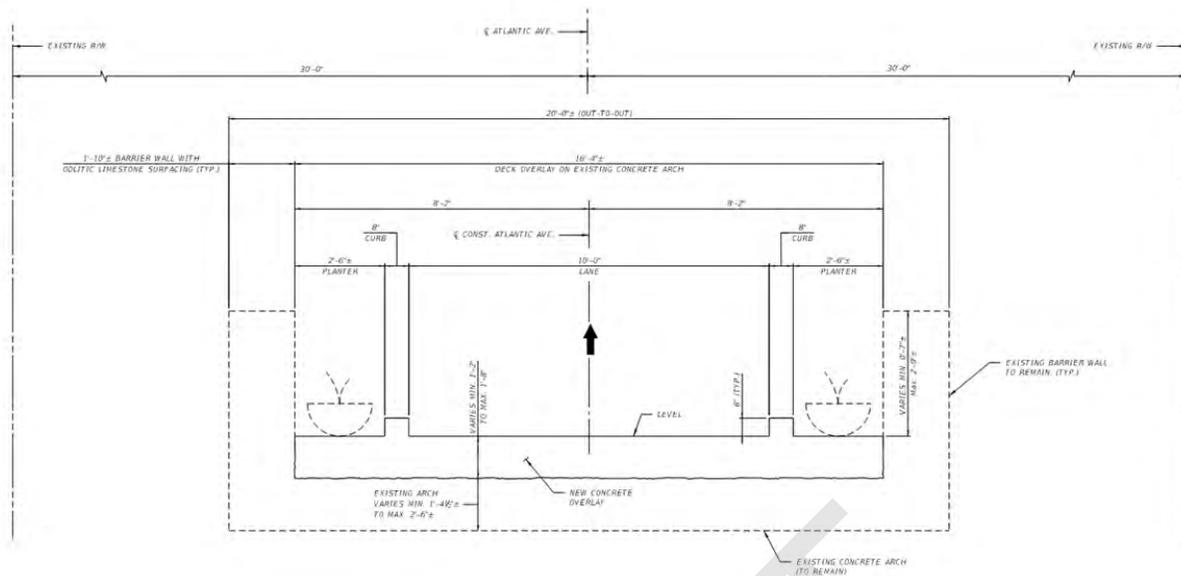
Bridge Rehabilitation Proposed Typical Section
